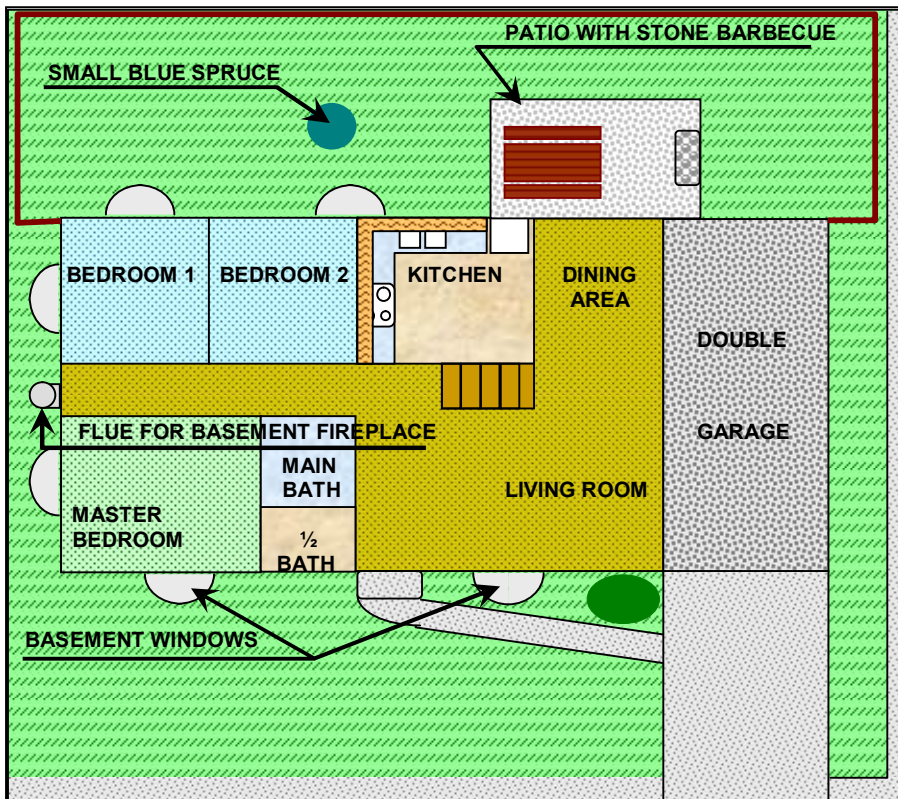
A floor plan of our Casper residence located on Missouri Avenue and sixth east. See figure 14-21.
